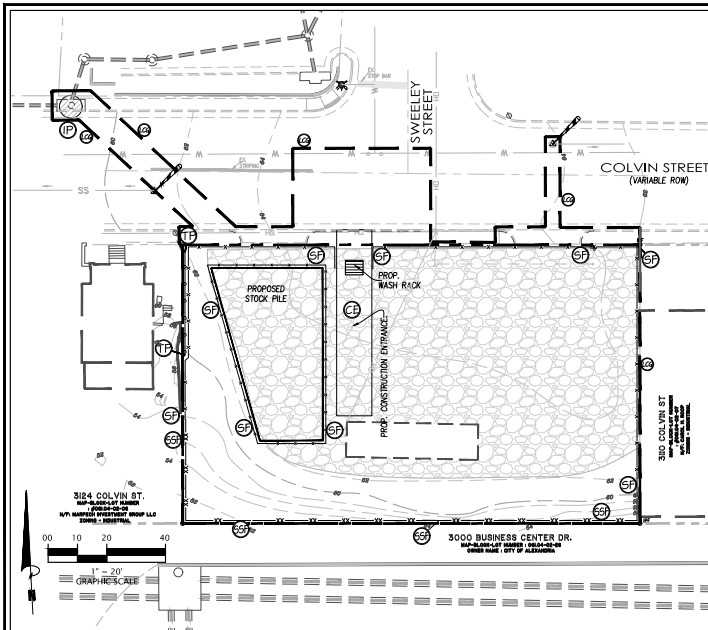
EXHIBIT : EROSION AND SEDIMENT CONTROL PLAN PHASE - I
